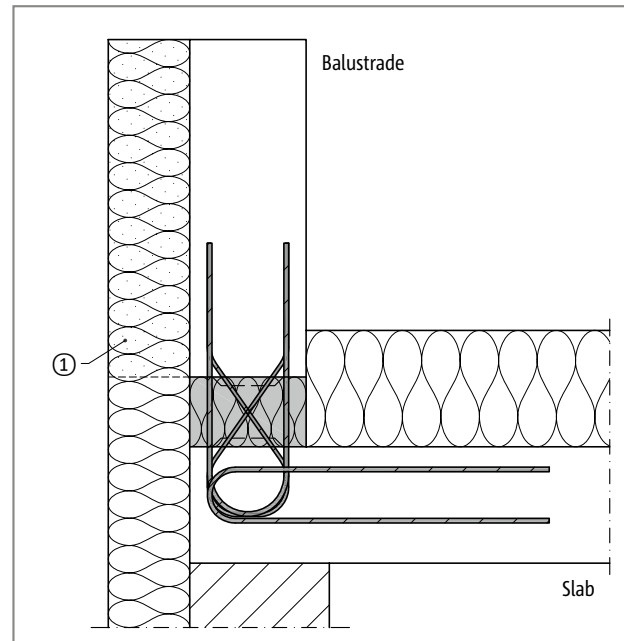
Schöck Isokorb® XT type A: Connection to a balustrade (type A-MM2-VV1)
